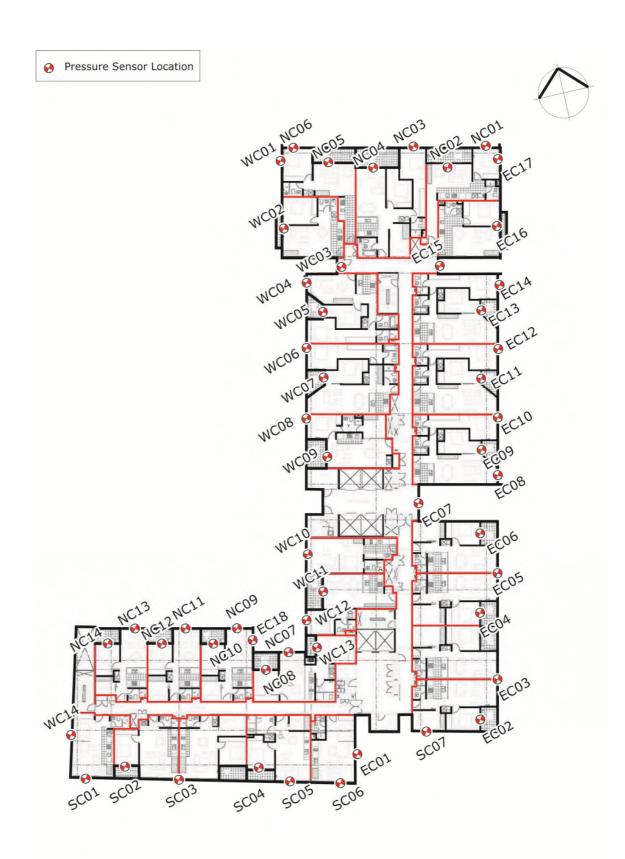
Opening Locations and Internal Apartment Layout - Level 7
